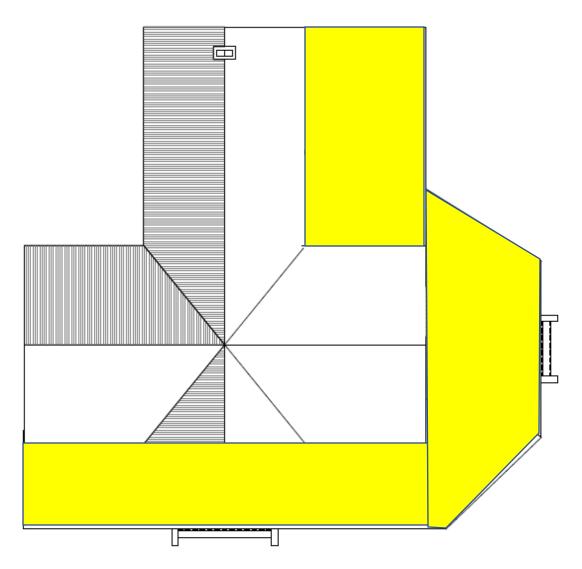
Existing roof plan. Standing seam sections are colored in yellow, all other roofing is metal shingle.
